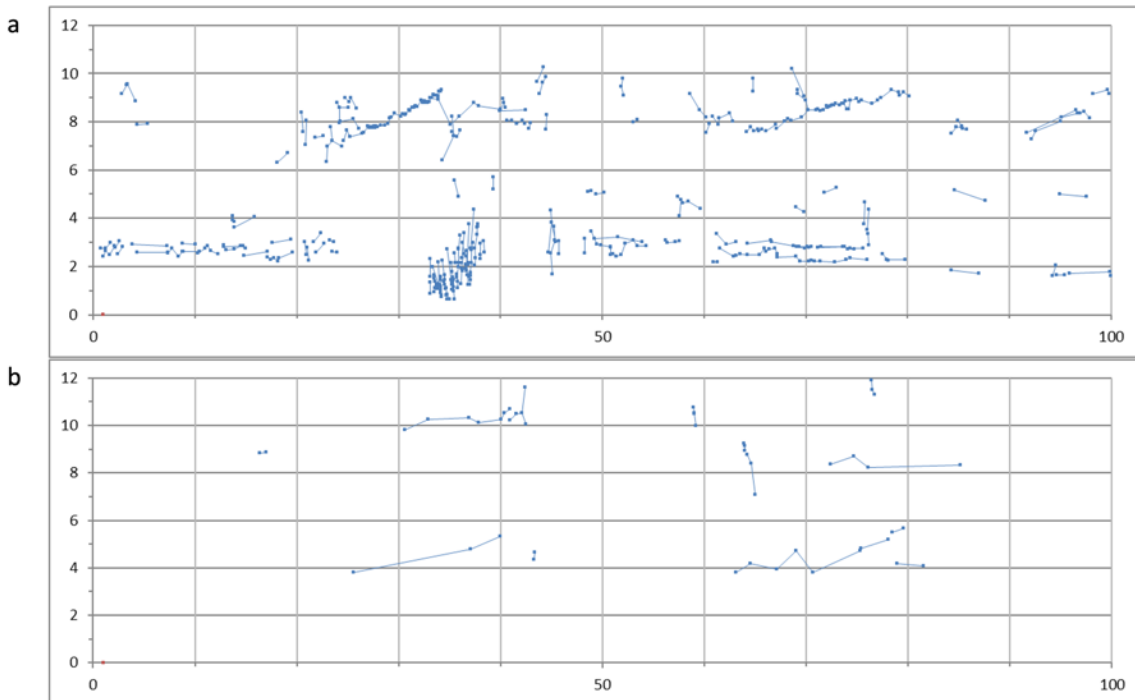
Section E8A Cracking Results (a) Prior to Construction and (b) After Loading
